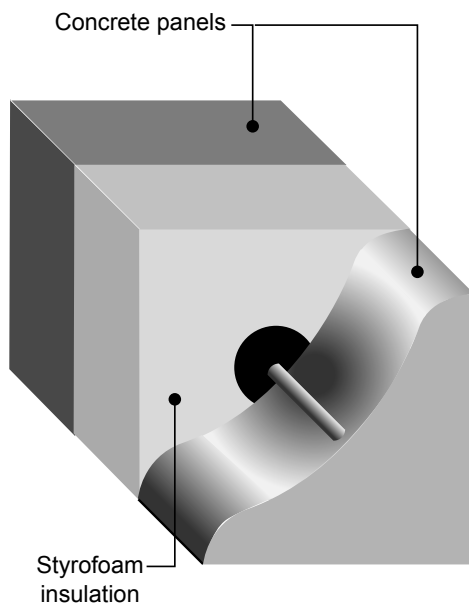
A typical cross section of thermomass insulated concrete wall panel, R-value = 3–3.5 (source: Thermomass Building Systems)
